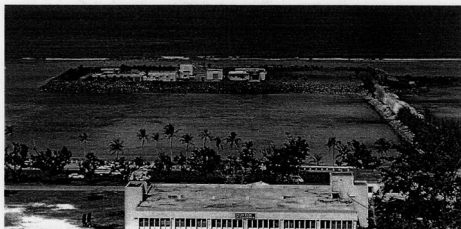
Hagåtña waste water treatment plant. The access road (right side of picture) was damaged during Typhoon Paka. The Agana Boat Basin is to the right of the access road.
